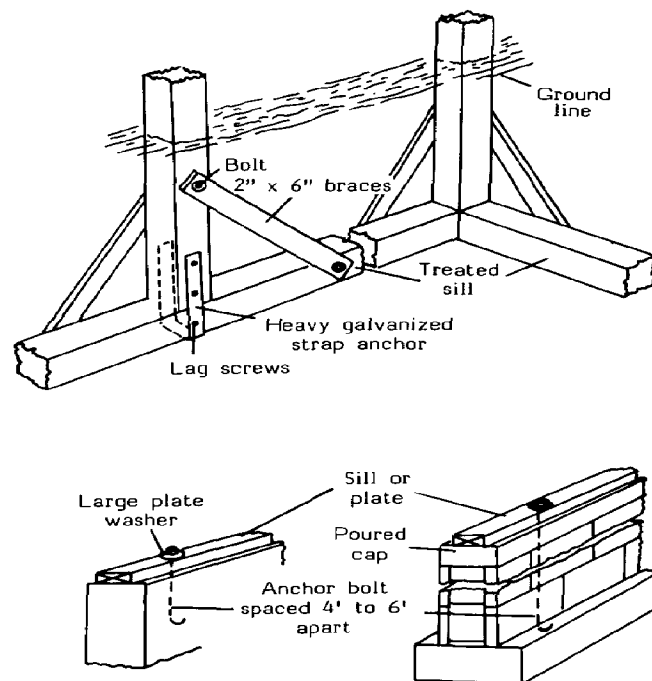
Foundation anchorage. Top: anchored sill for shallow embedment. Bottom: anchoring sill or plate to foundation. Source of bottom drawing: *Houses Can Resist Hurricanes*, U.S. Forest Service Research Paper FPL 33.
